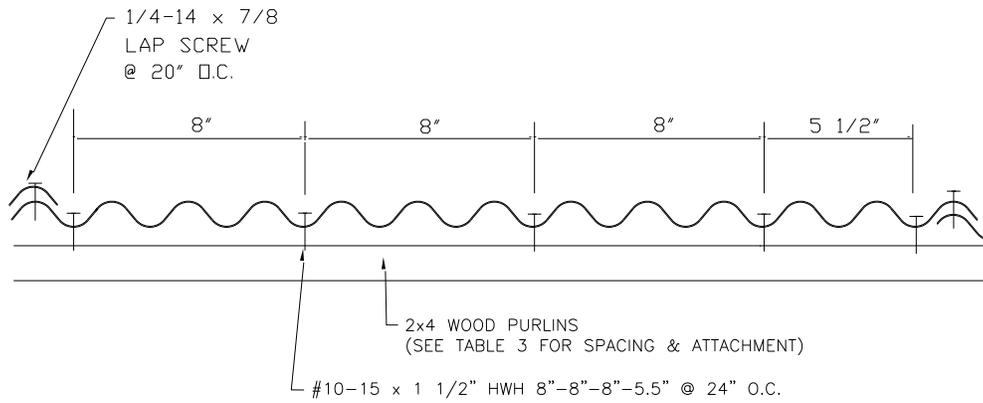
Cor Span Metal Roofing Panel Secured to 1x4 Wood Purlins
